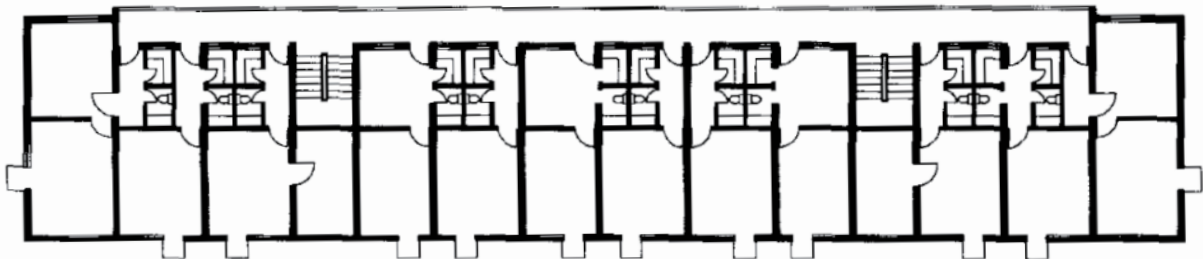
Plan of the apartment building with open corridors on Quzhenern Road in Shanghai
